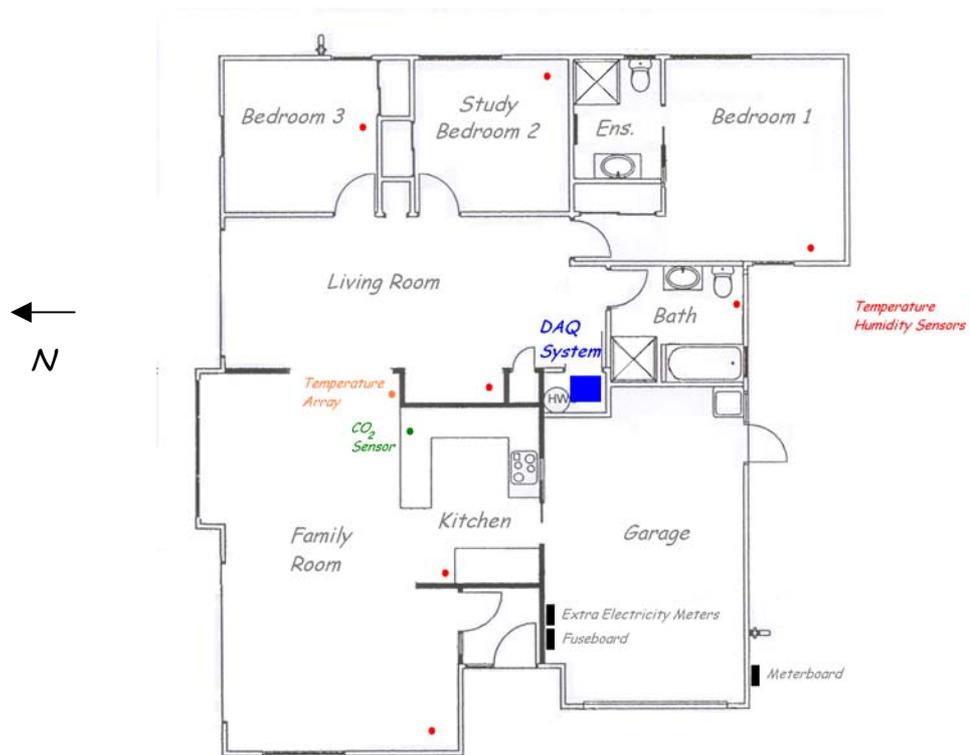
Floor plan of the Waitakere NOW Home® (North is to the left) showing monitoring equipment locations
